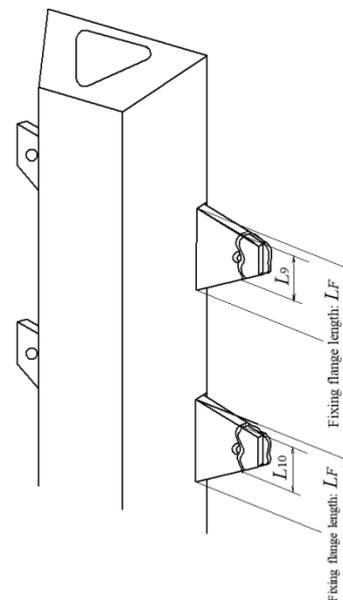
Damage measurement (Separation-Multiple flange)
